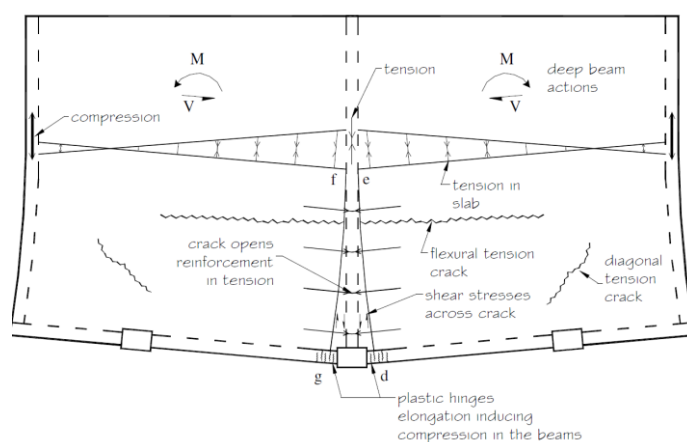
Inferred floor deep beam bending (Fenwick et al. 2005)
